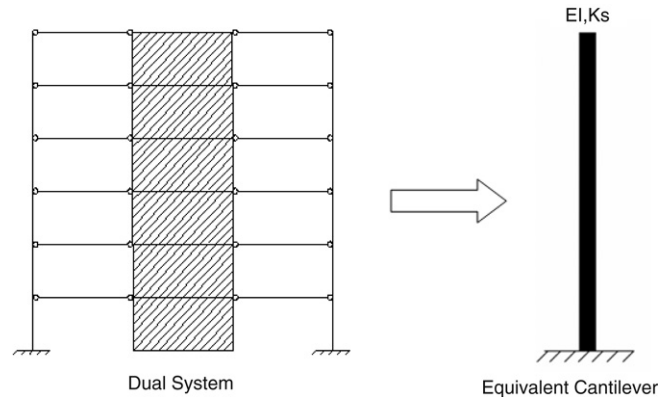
Wall-frame structure idealized as a shear-flexure cantilever.
